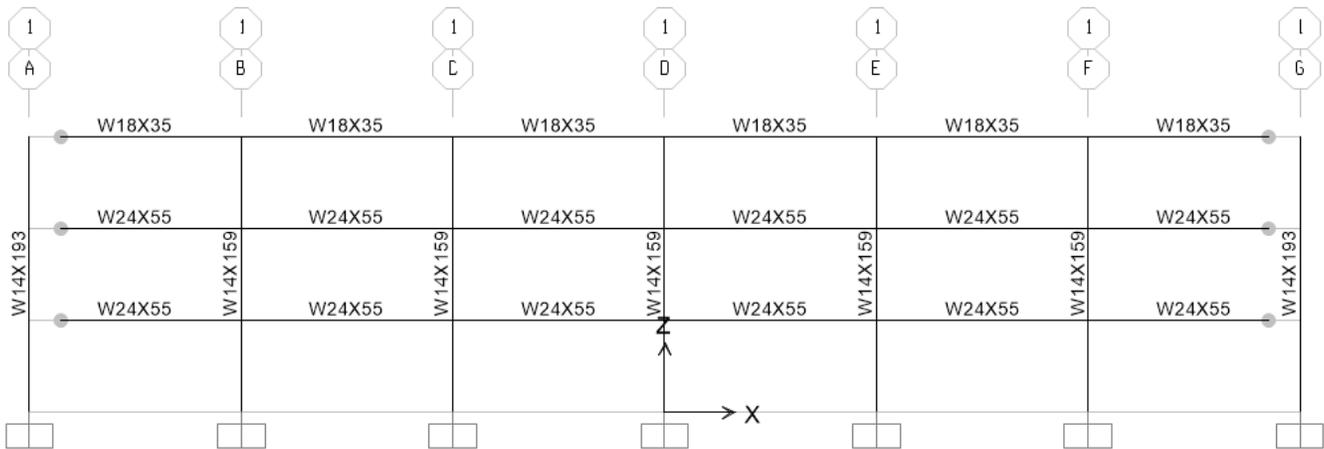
Elevation View of Three-Story Moment Frame as Girder
